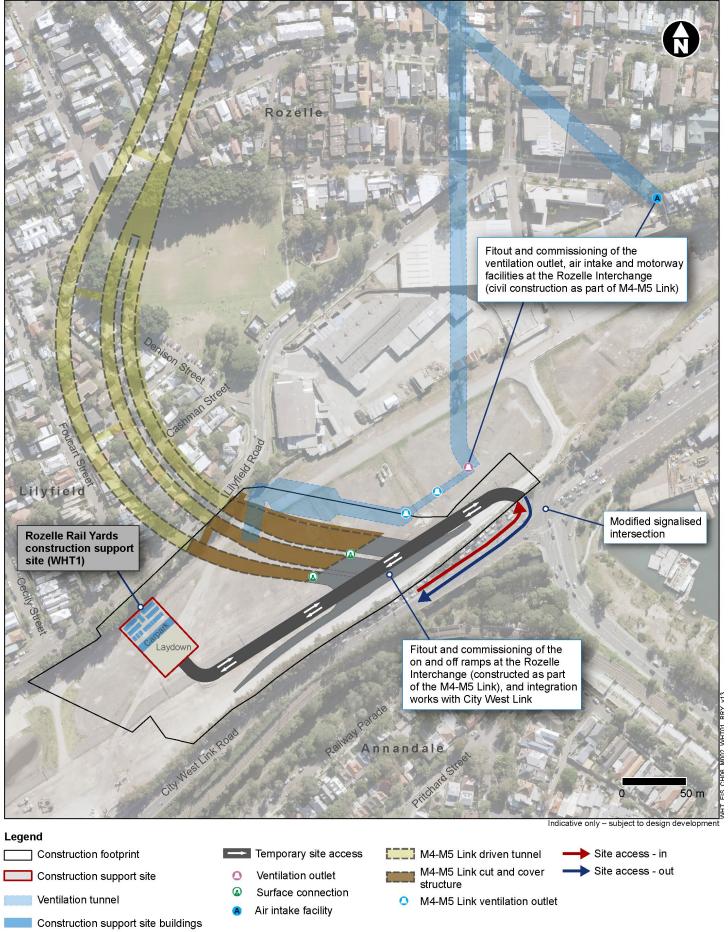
Indicative layout – Rozelle Rail Yards construction support site
